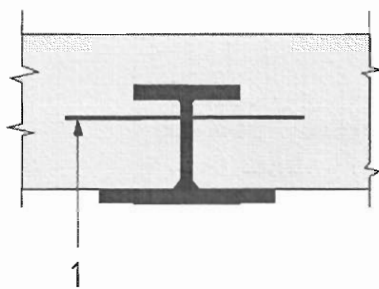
Composite beam comprising steel beam with no concrete encasement
